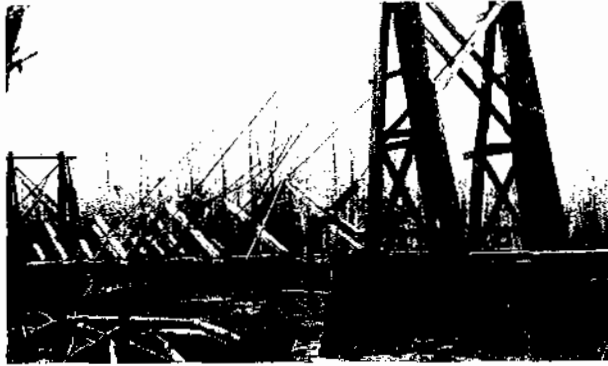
South Myrtle Creek Bridge, Washington. (Courtesy of John H. Garren, FHWA Washington Division.)
